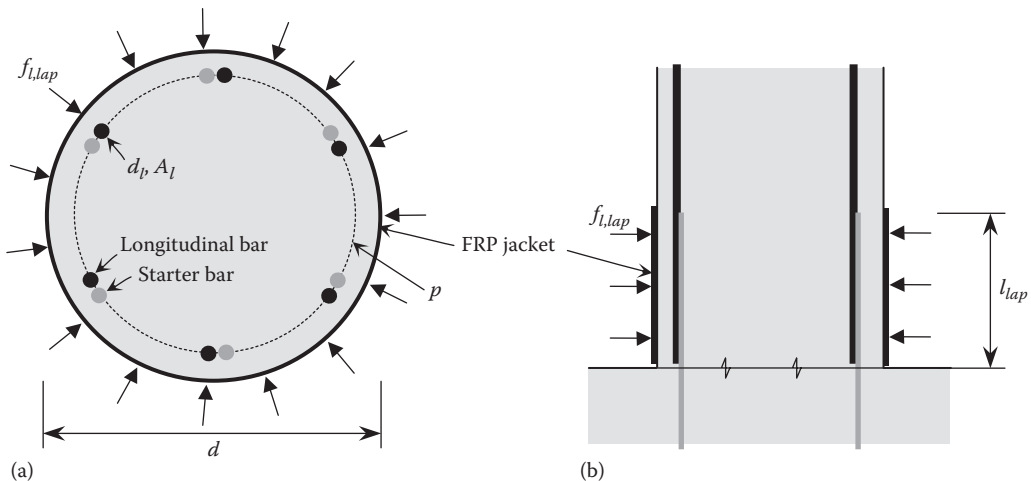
(a) Column cross section and (b) elevation in the lap-splice region.
